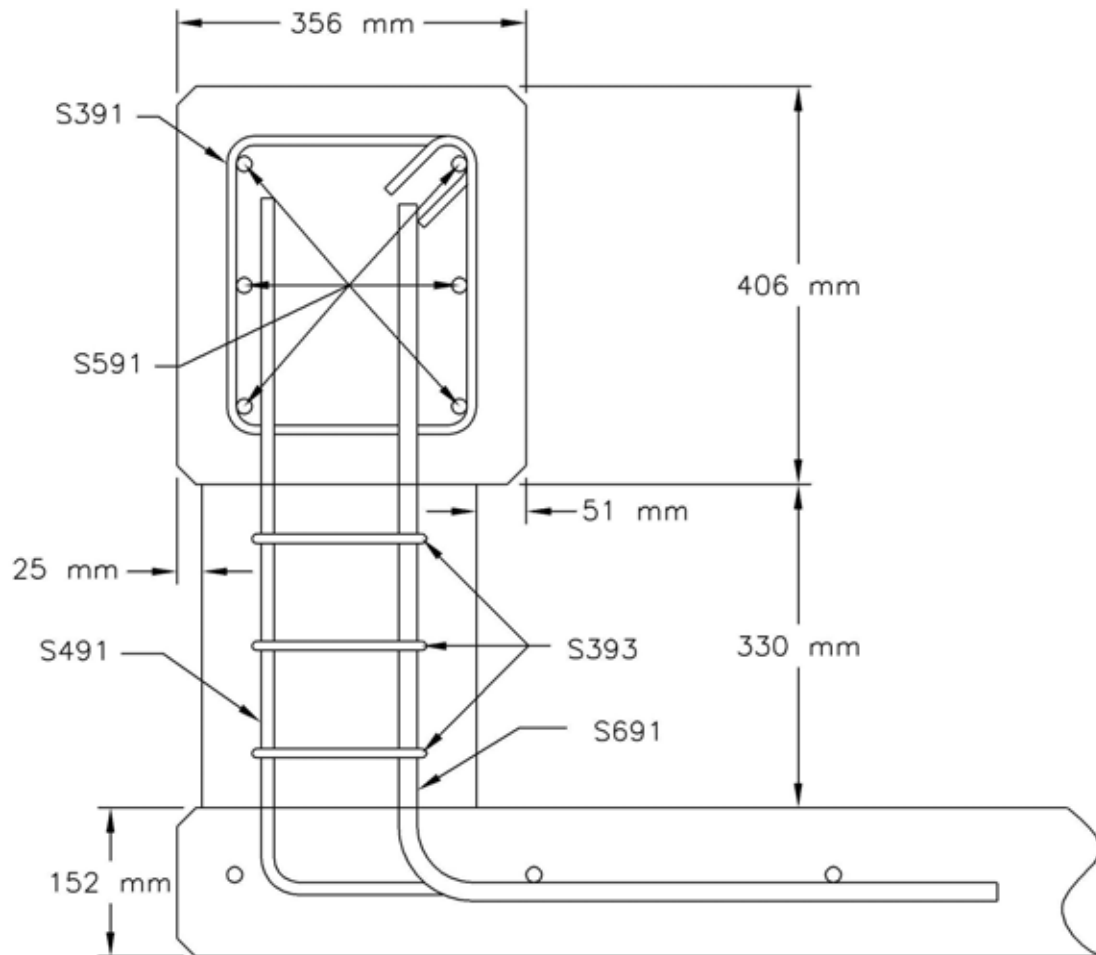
Layout for Open Concrete Bridge Rail Attached to Inverted Tee Bridge Deck System
